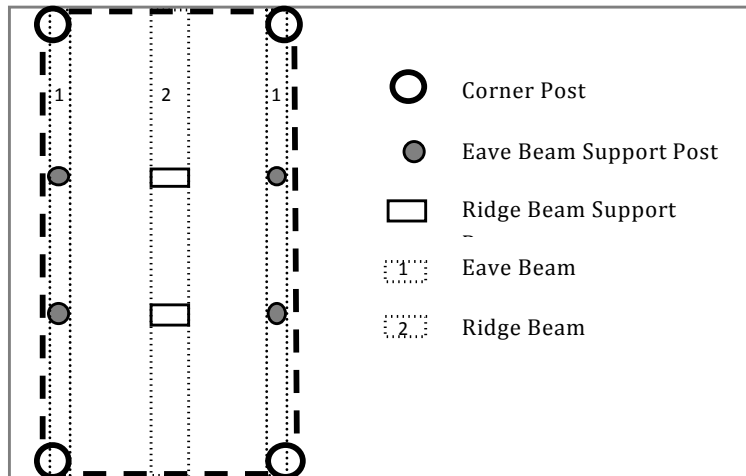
Idealized plankhouse with architectural elements labeled.
